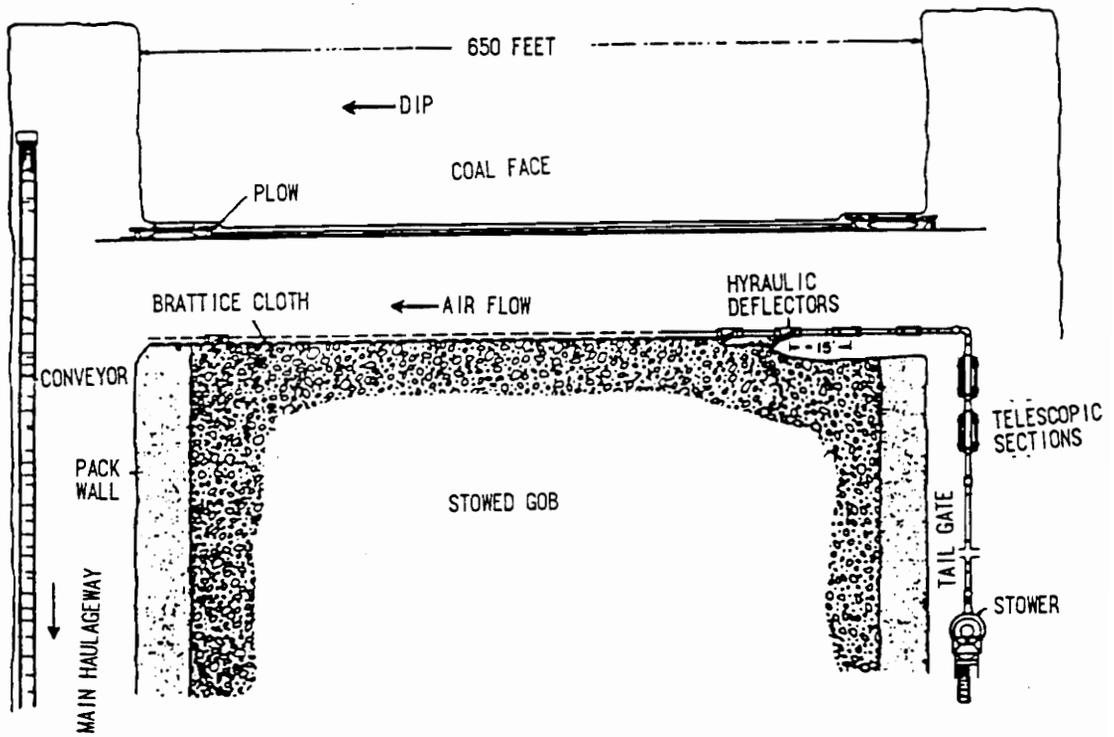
Lateral pneumatic-stowing layout for a longwall face
